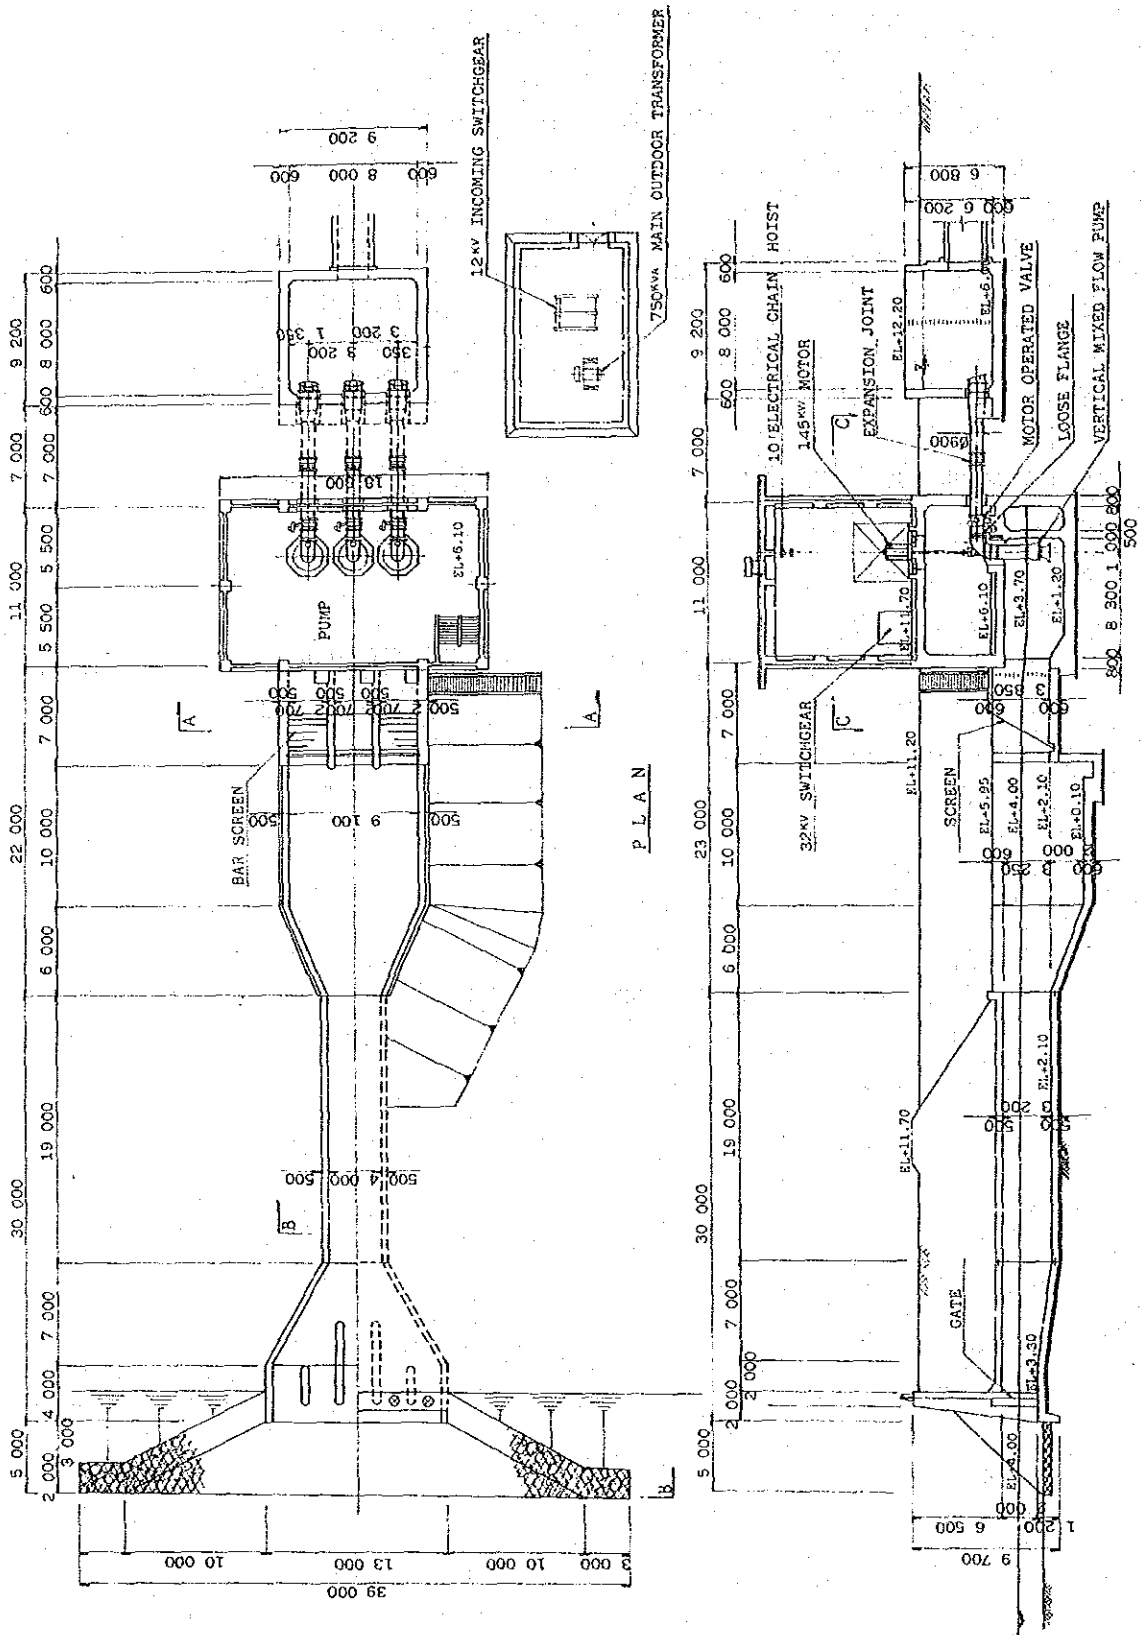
GENERAL PLAN OF MAIN PUMPING STATION
